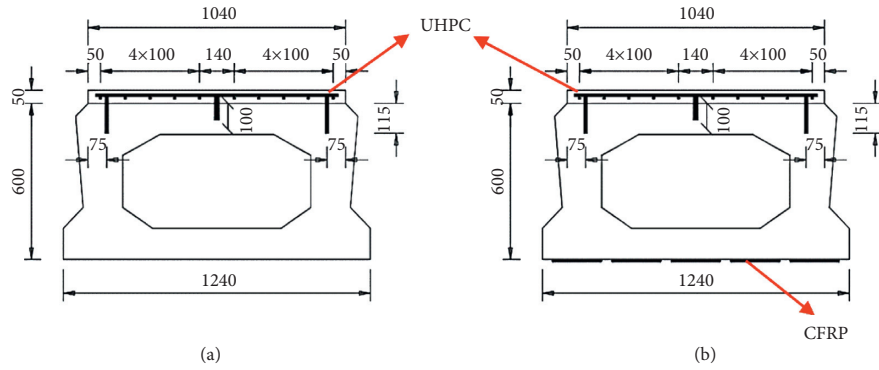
Midspan cross section of Specimen S2 and S3. (a) Specimen S2. (b) Specimen S3.
